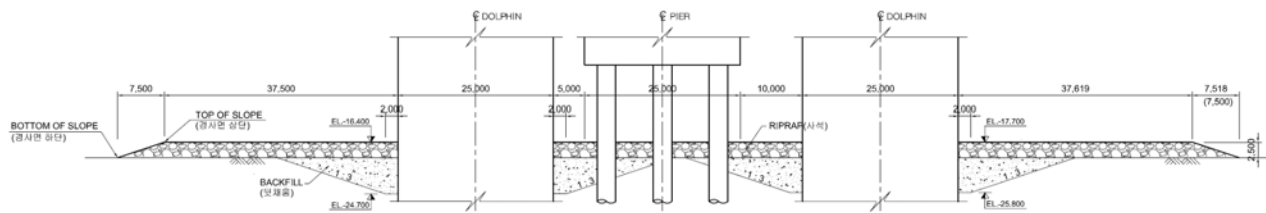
Cross-section of the rip-rap protection around the pier and dolphins
